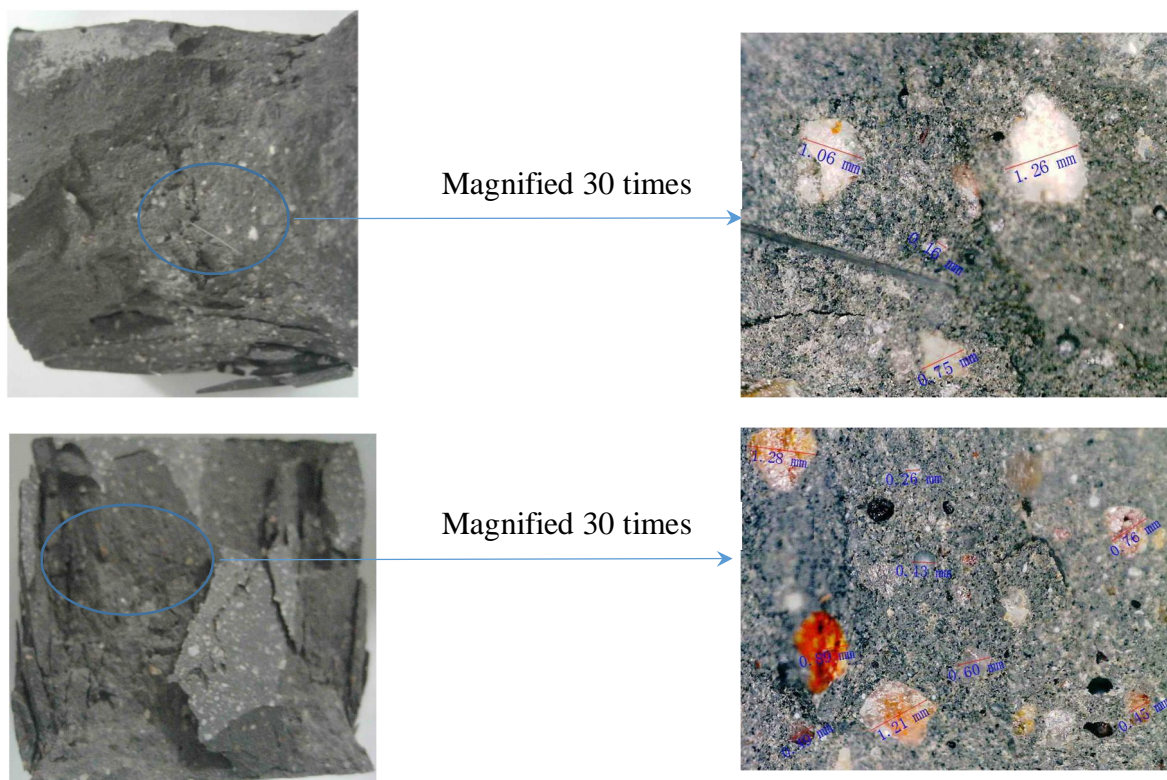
Shear failure of sand in UHPC specimens after compressive test.
